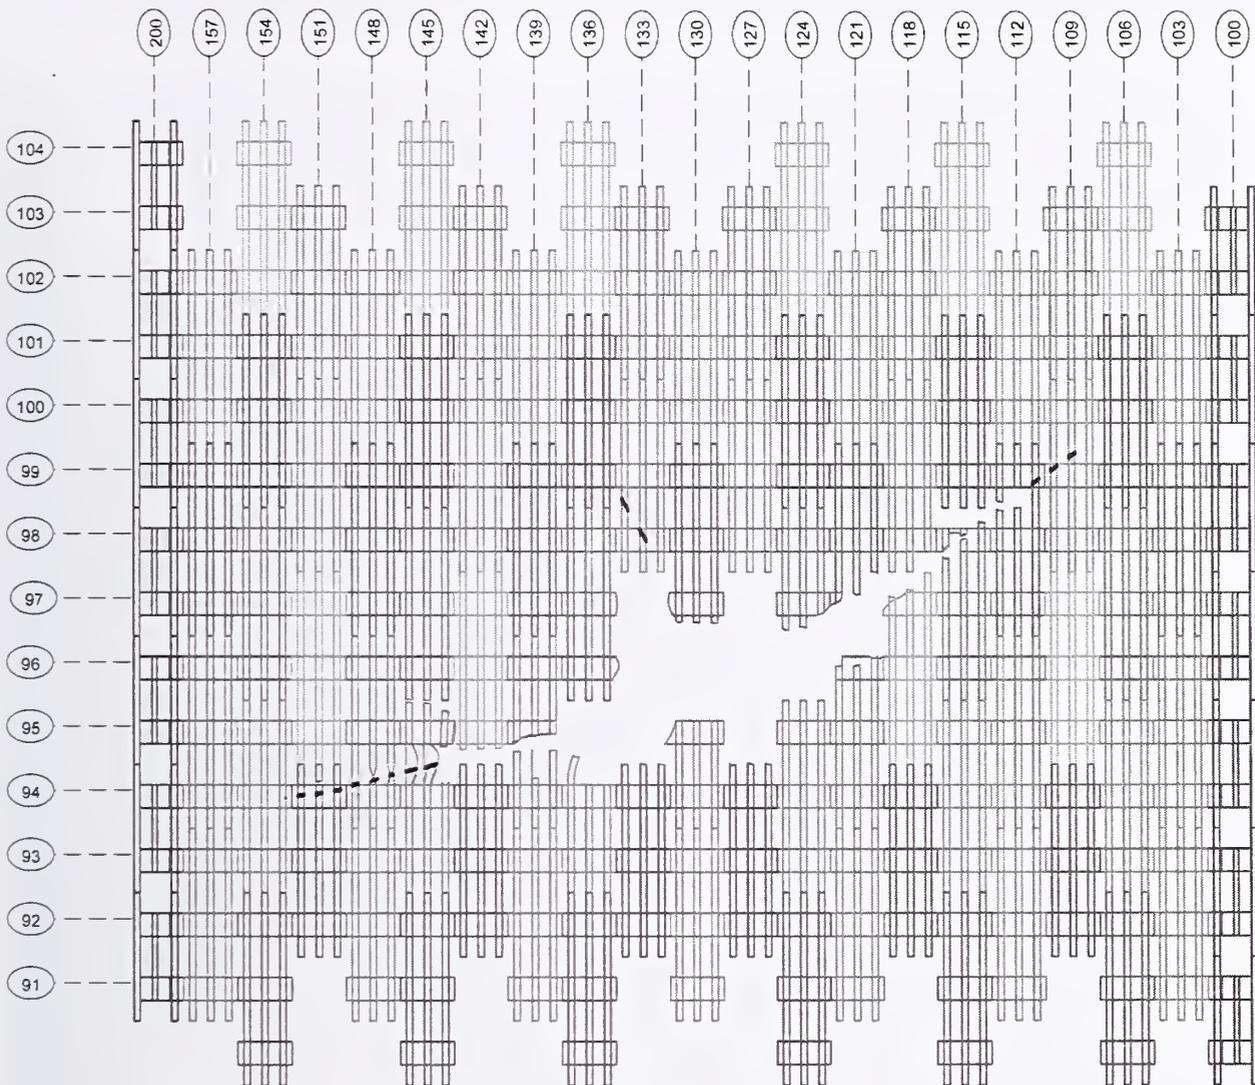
A drawing shows the aircraft impact damage to the steel façade of WTC 1. The dark dotted lines indicate locations where the wings and vertical stabilizer of the aircraft marked the aluminum cladding on columns.
